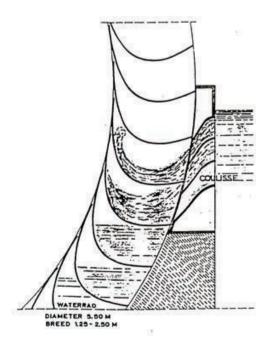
A breast (apron) with water guideways that provide better filling of the buckets. breast, apron breast wheel water guideways Because there was a lot of water loss between the weir sill and the buckets, a stone or concrete raised edge was built, the breast that closely butted up to the waterwheel. It is therefore referred to as a breast wheel. Above that breast, sometimes two or three water guideways (see Fig. 6.2.3.1) were made through which the water flow was sent in the direction of the buckets. This caused the water to flow more gently into the wheel and the buckets to fill better. Another hatch was sometimes inserted at the bottom of the breast (apron). When there was very little water, this hatch was opened and the breastshot wheel acted as an undershot wheel.
